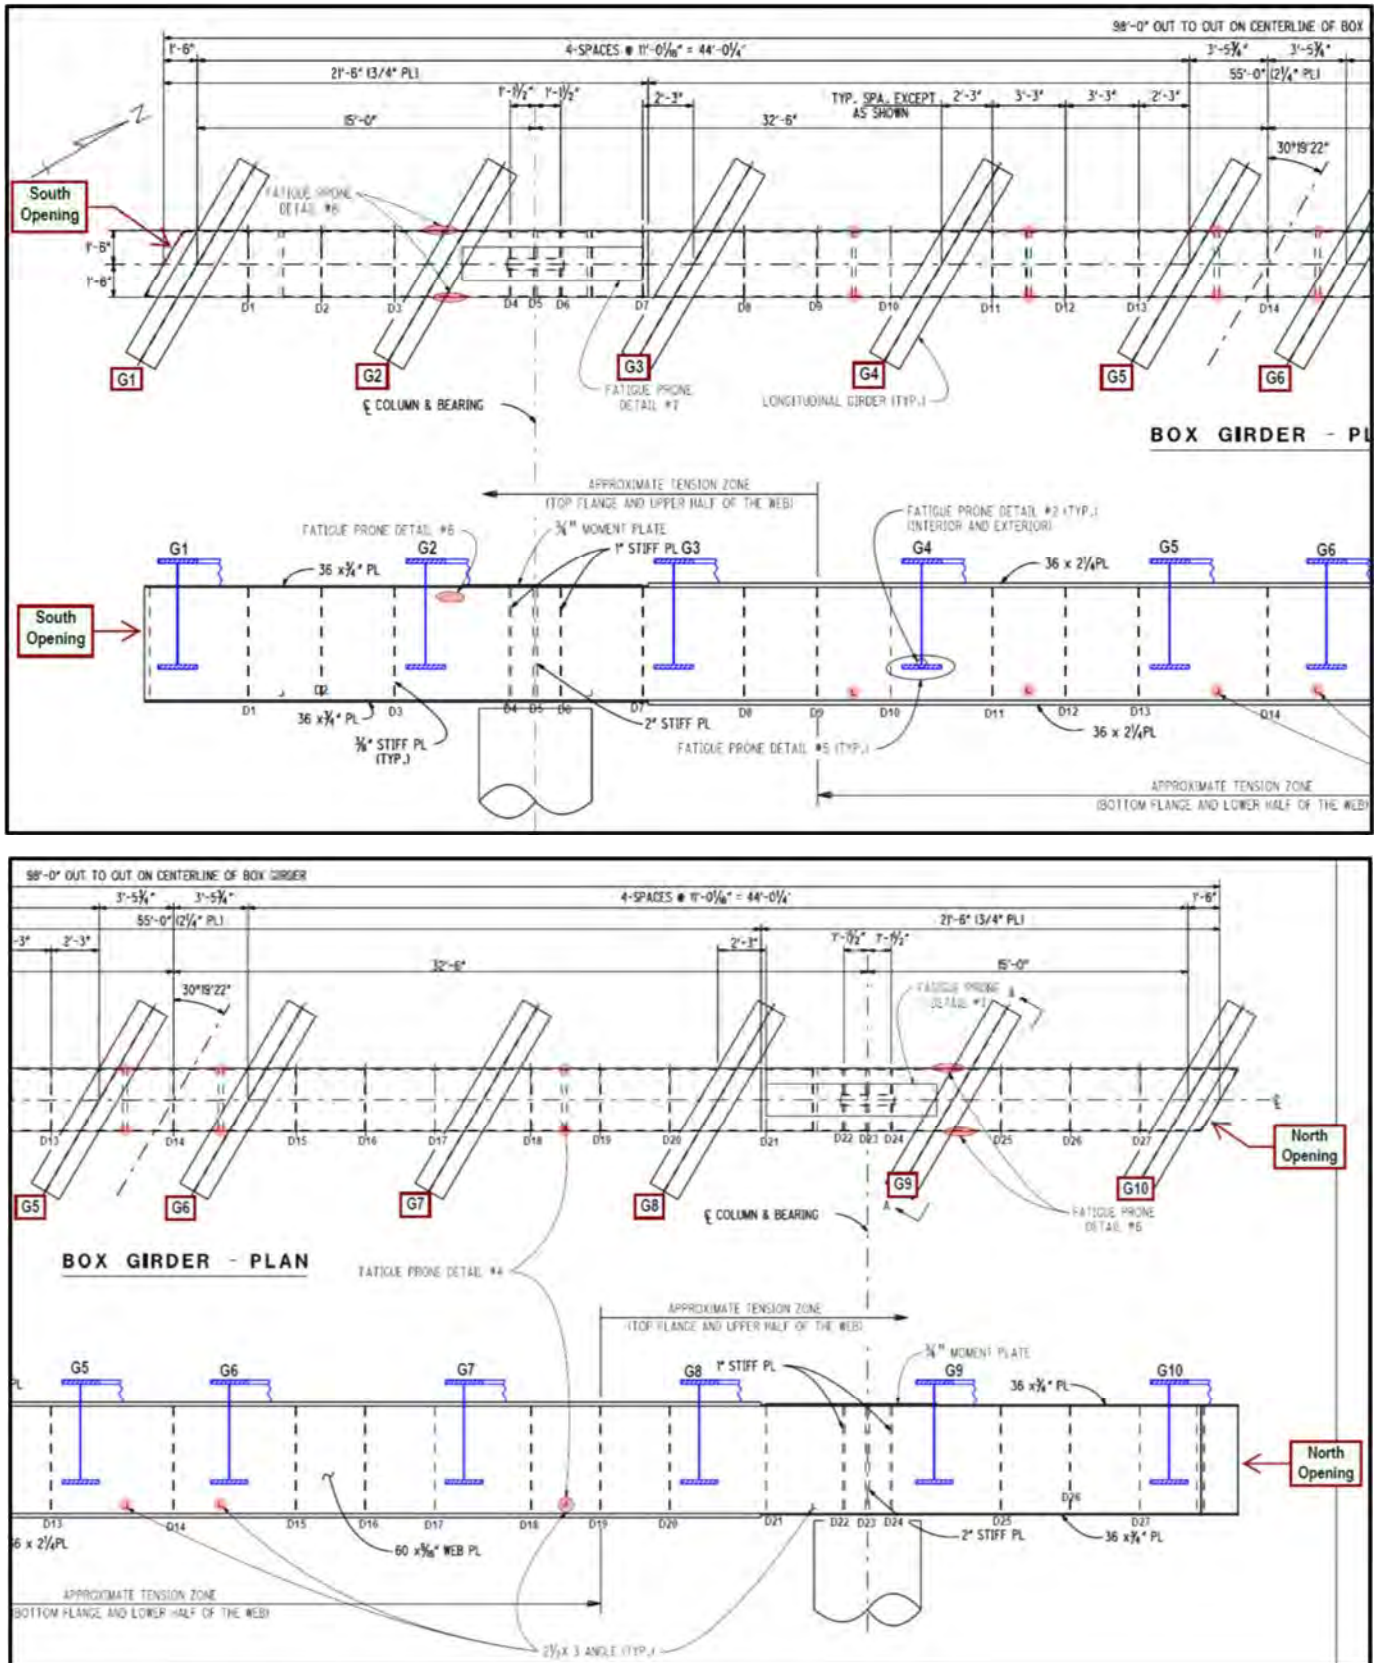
STA-077-0912 – Fracture critical integral steel box girder nomenclature and orientation plan
